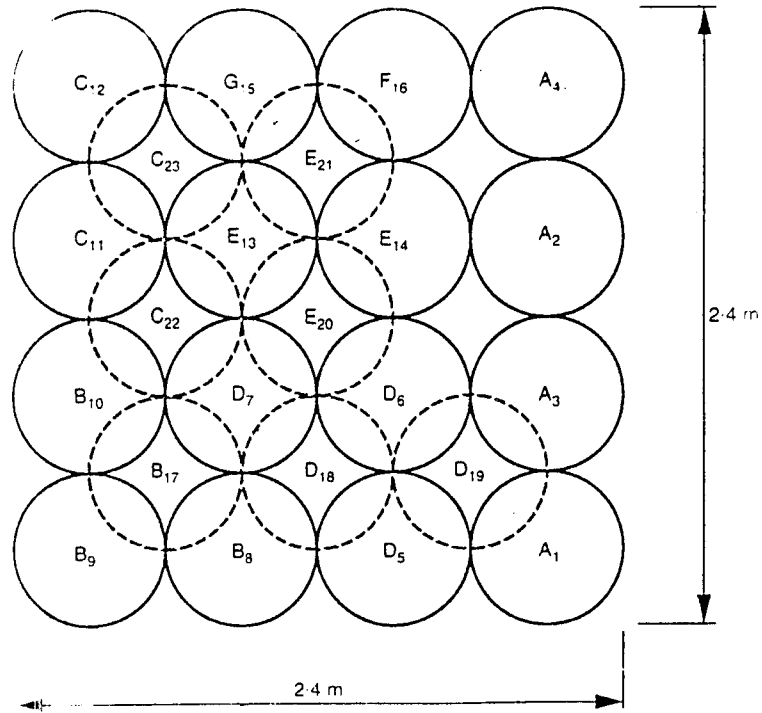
Plan of the constructed columns (Al-Tabbaa and Evans, 1999b).
